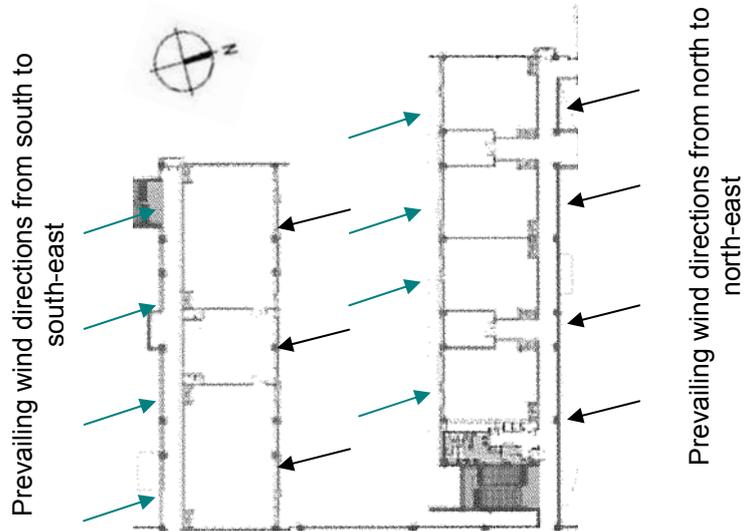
Building layout shows all rooms with window openings facing the north and south directions.
